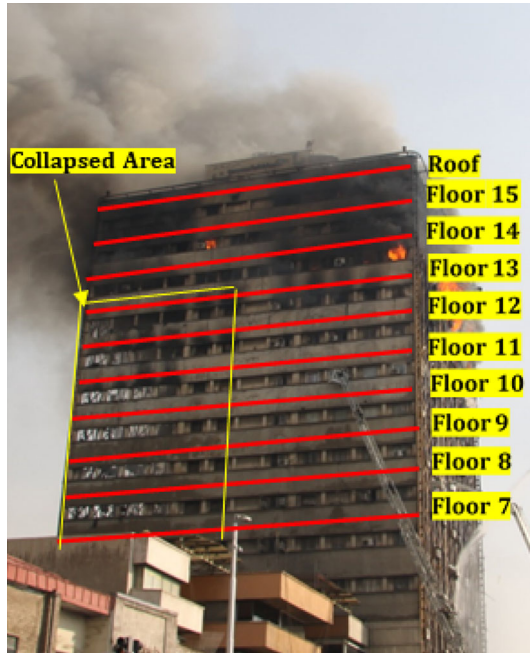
West elevation of the building showing the floors collapsed partially in second stage.
